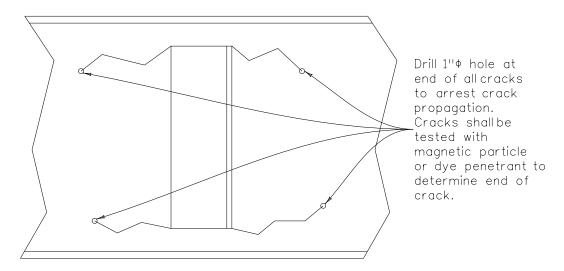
(K)-3 Sample Detail of Drilling Holes at the end of Fatigue Cracks
